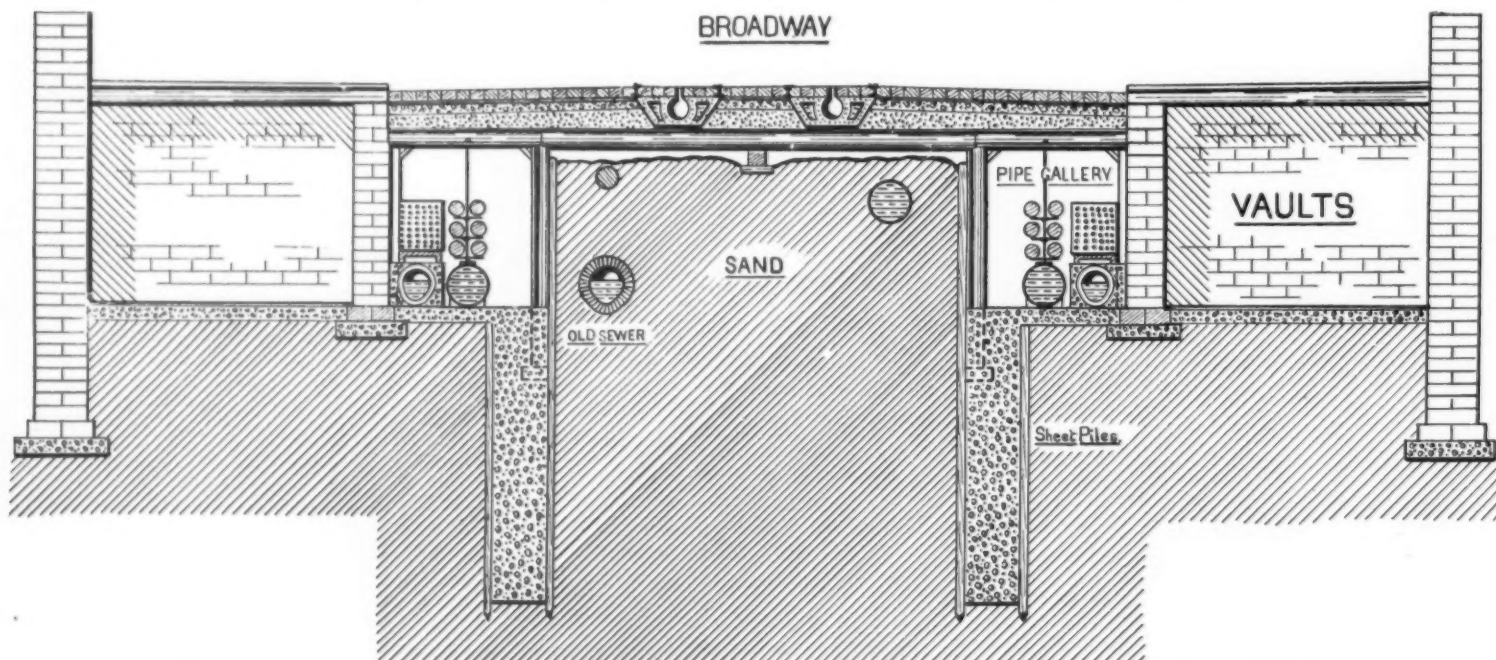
METHOD OF CONSTRUCTING THE PROPOSED RENO TUNNEL BENEATH BROADWAY, NEW YORK.
